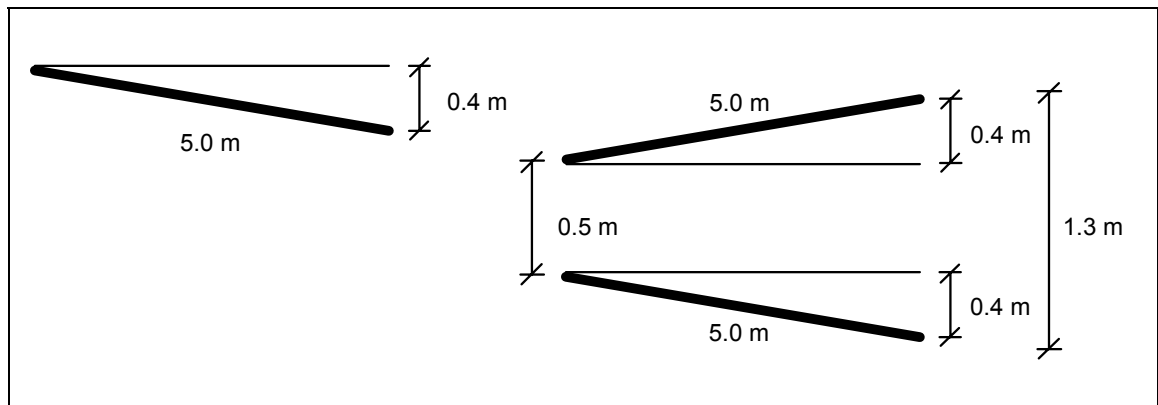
Drill holes with eccentricity at the bottom of the hole.
